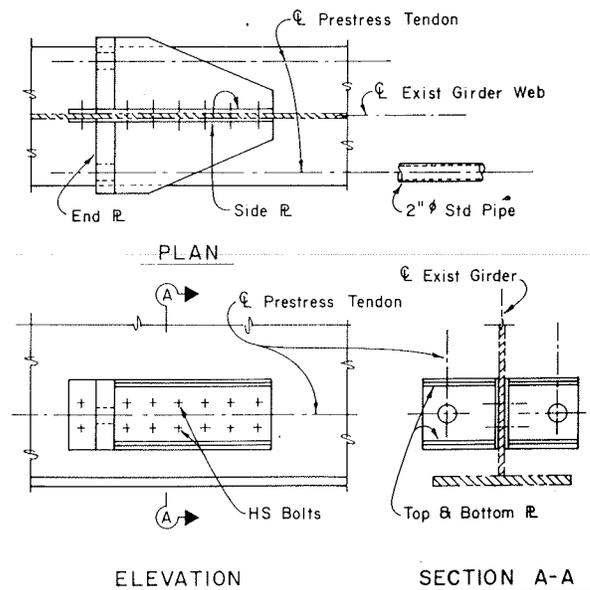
Prestress tendon anchorage—positive moment zone.
